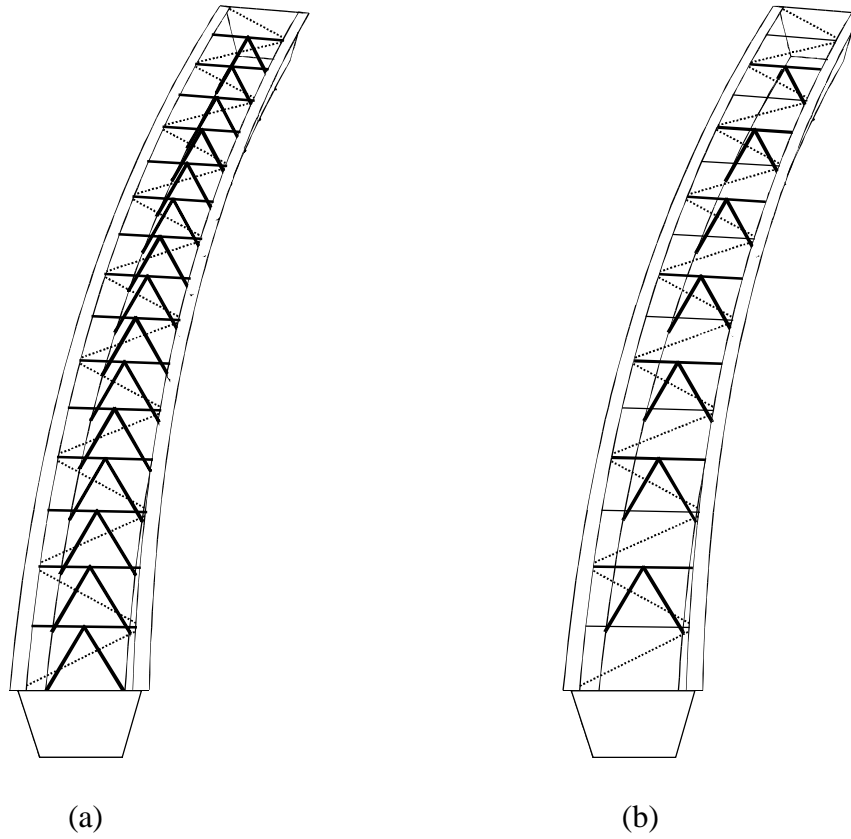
Horizontally curved box girders with SD type lateral bracings and internal K-frames: (a) One-panel spacing; (b) Two-panel spacing
